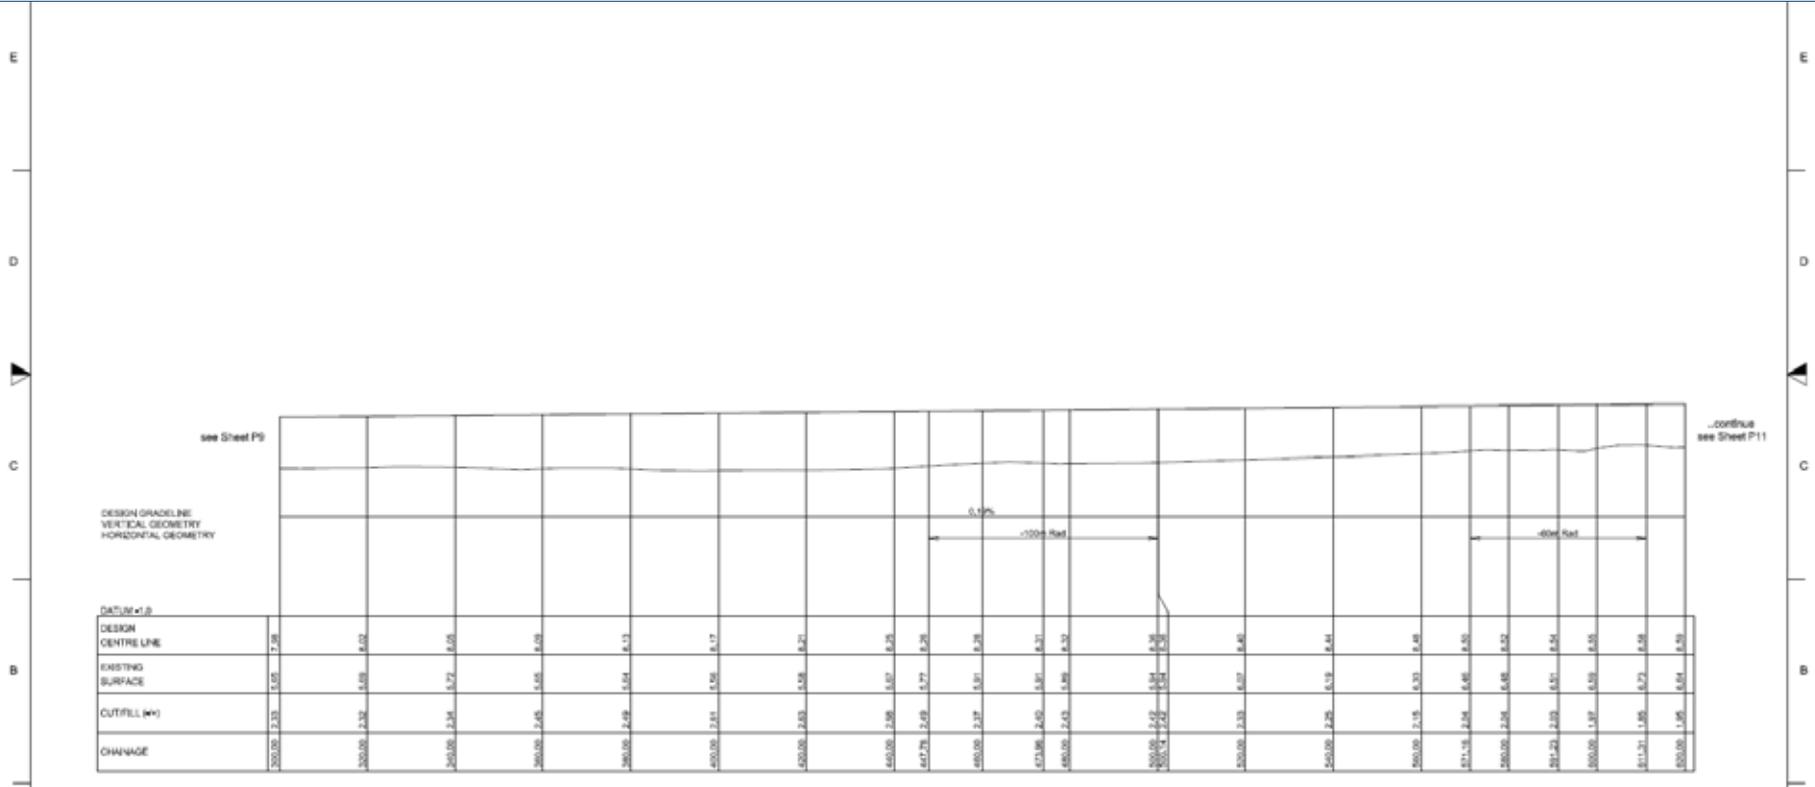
Longitudinal Section 2 from Ch.300 to Ch.620
